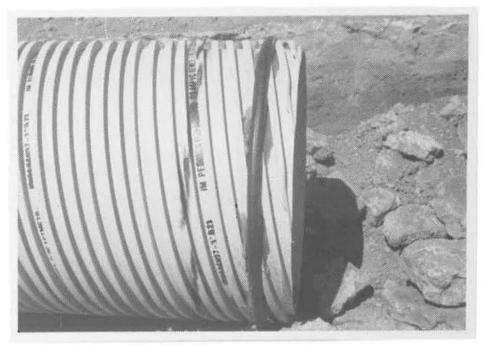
21" JM PVC Sewer Pipe. Note that sealant was required to fill gaps under the gasket.
